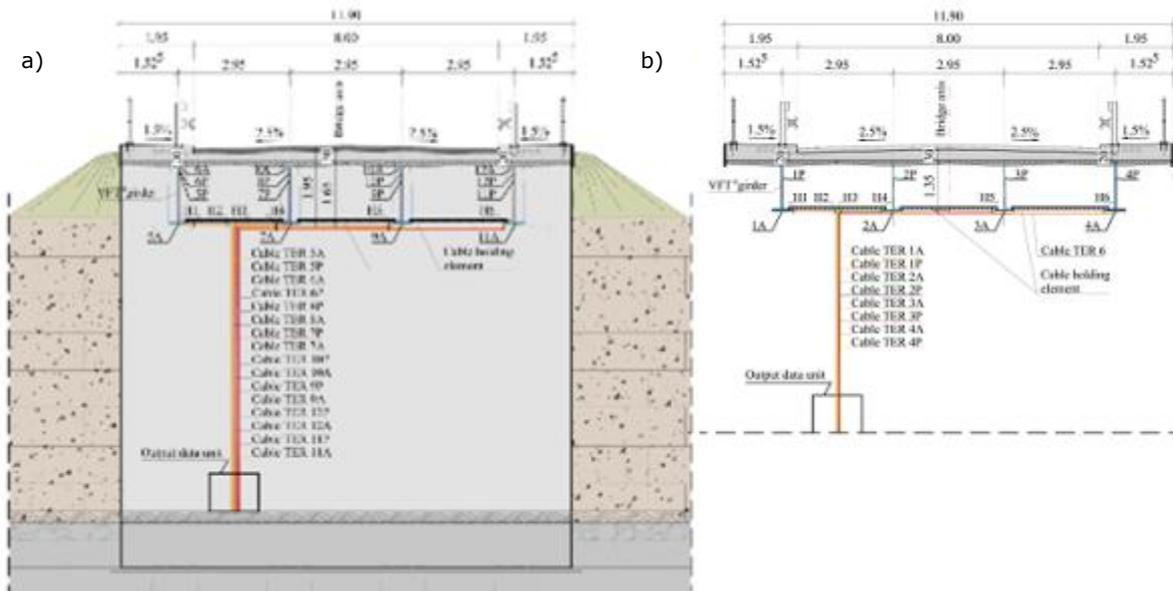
Installed strains on the section of the bridge; a) Cross section on the supports area; b) Cross section on the field.
